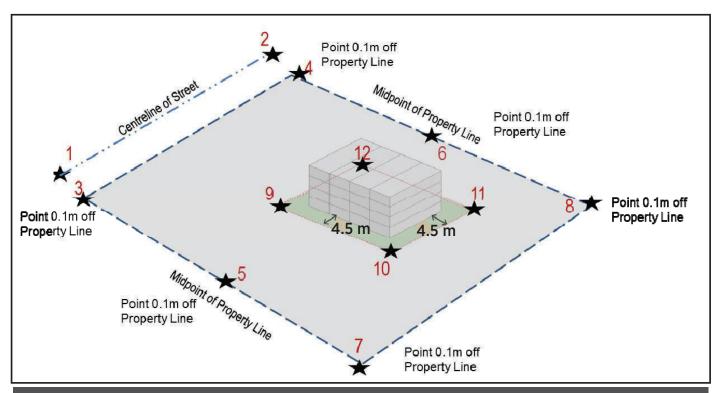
Context Grade: The average of 12 Points. 8 of which are around the perimeter of the site and 4 points located 4.5 m around each building
